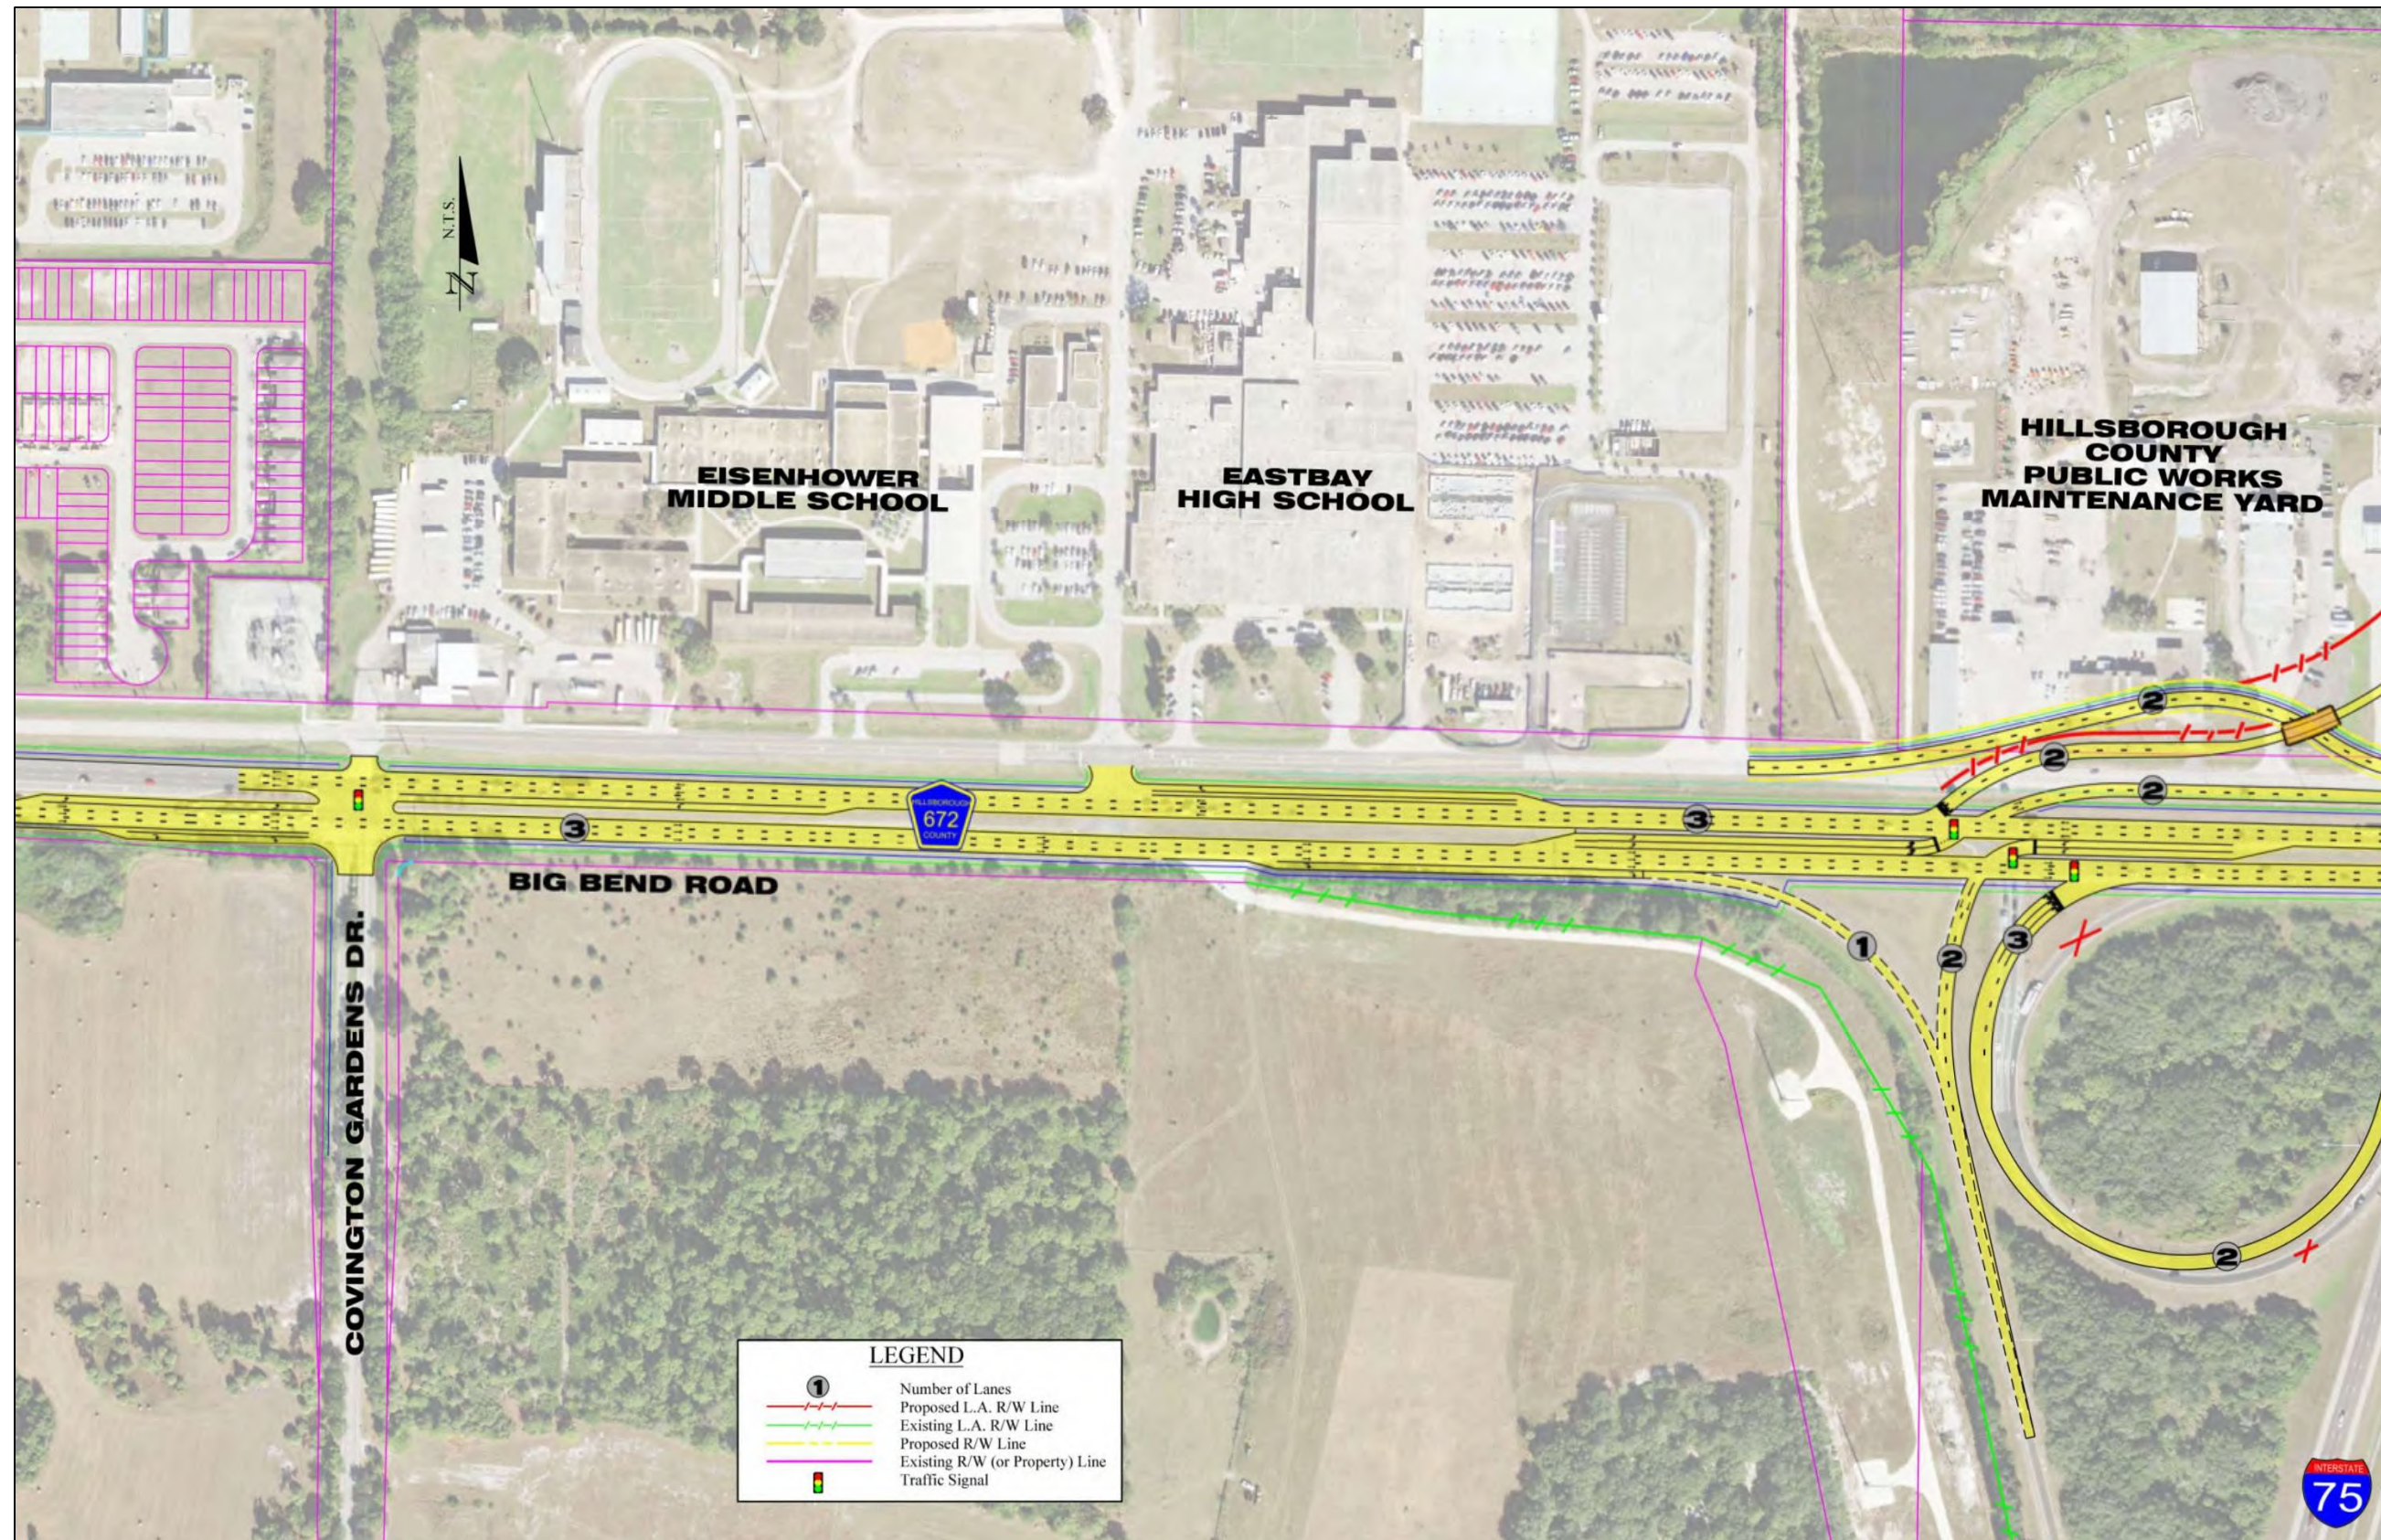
C – Proposed Lane Geometry and Traffic Control (Sheet 3 of 4: Big Bend Road, East of I-75 – Detail)
